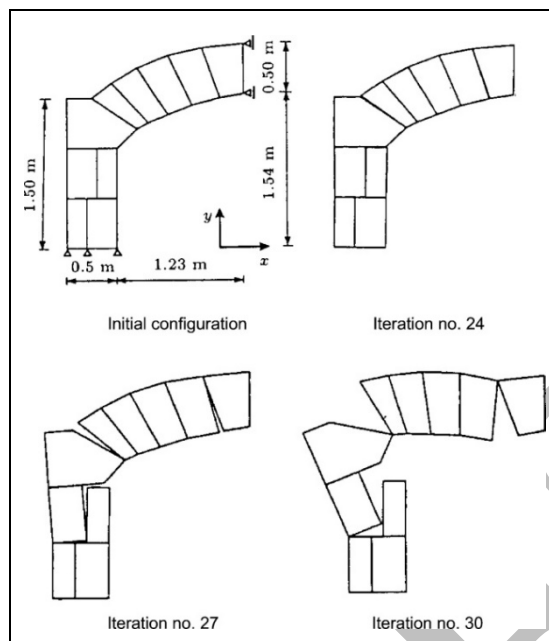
Failure mode of a masonry arch (Mamaghani et al.1999).
